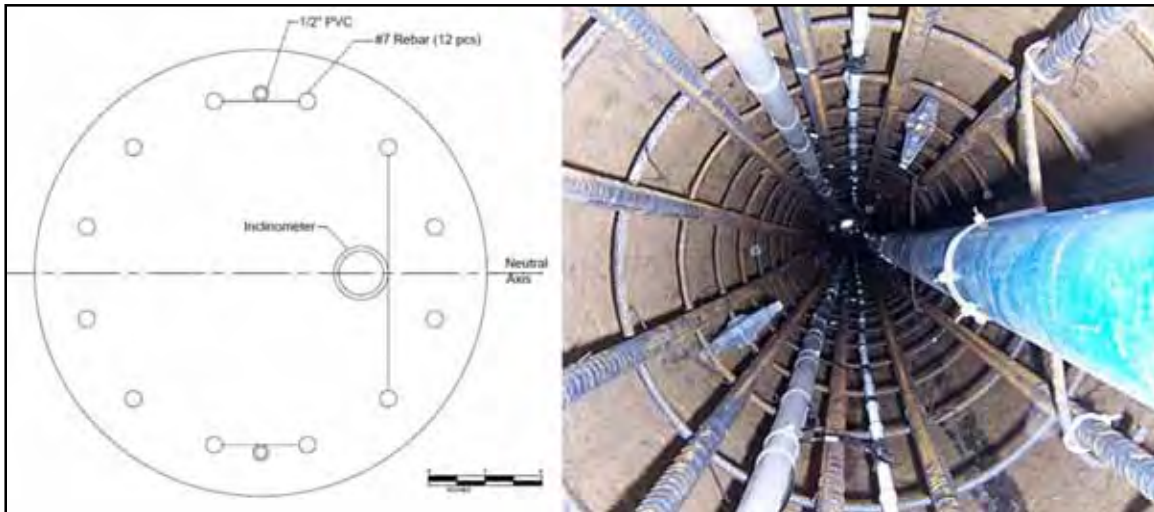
Plan view of instrumented rebar cage before concrete placement.
